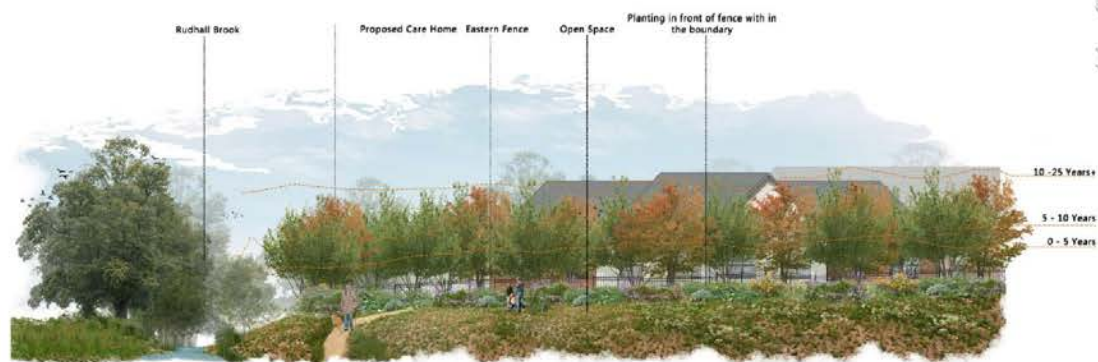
PROPOSED LANDSCAPE ELEVATION
